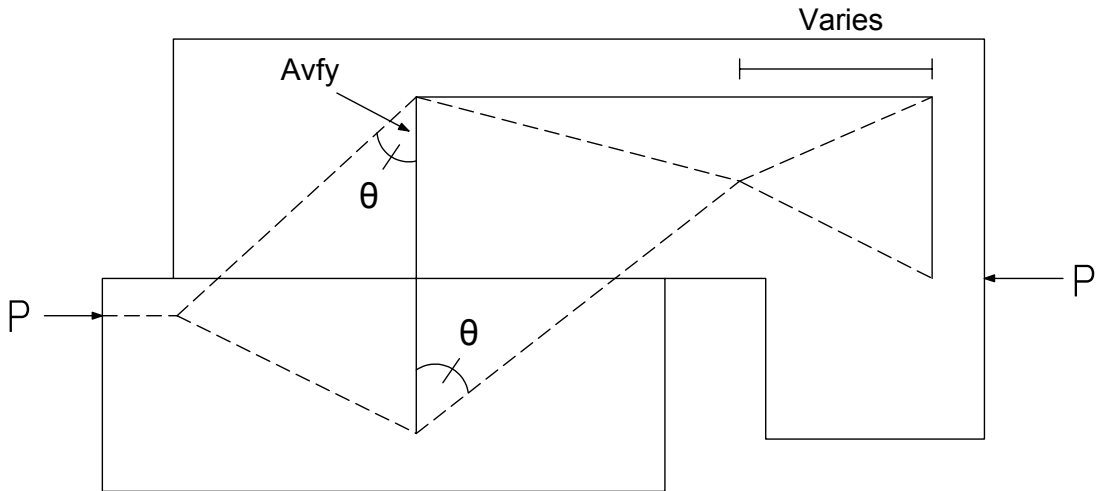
Strut and Tie Model for 18 in. Single or Double Leg Specimen
